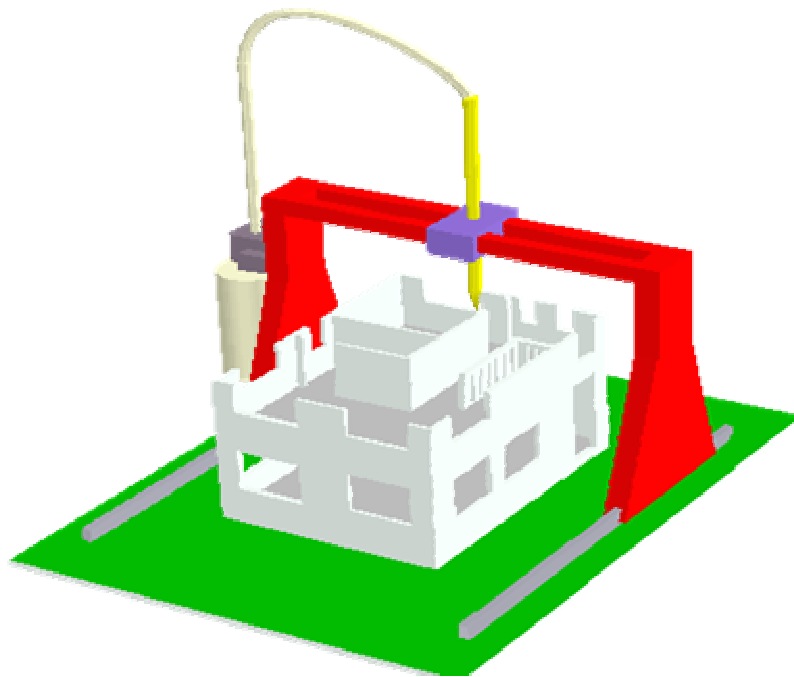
Residential building construction (Source: Khoshnevis-Japan paper)
